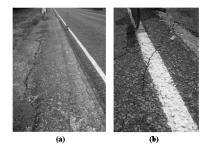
Difference in cracking pattern observed for (a) Reinforced section (b) Unreinforced section at site
